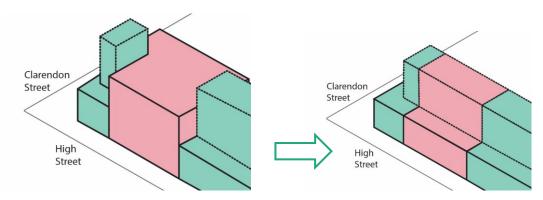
Varying street-walls for example High Street and Clarendon Street intersection (left) should be made consistent (right)
